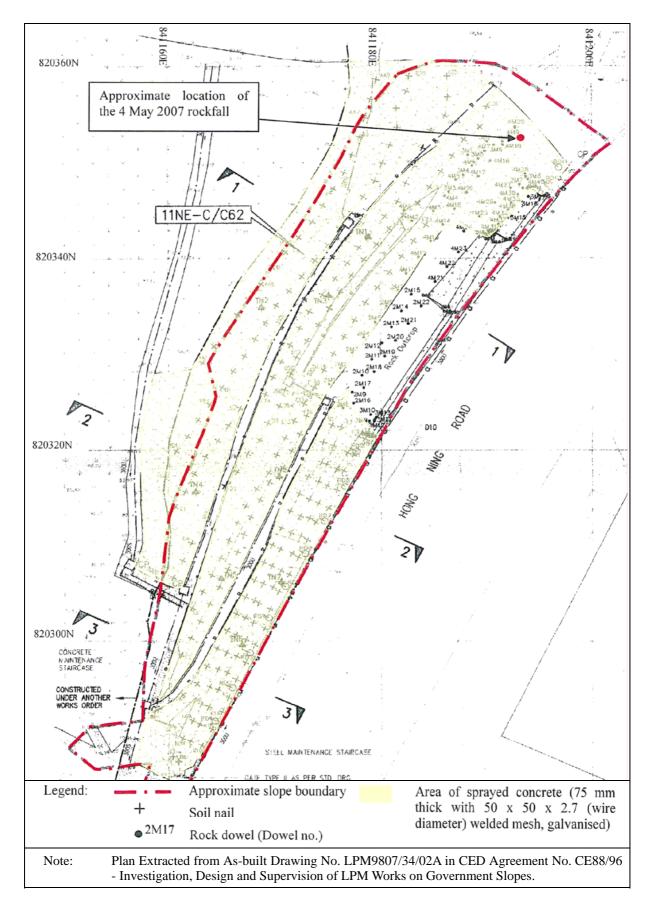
Layout of Constructed Slope Works Design by FHK in 1999
